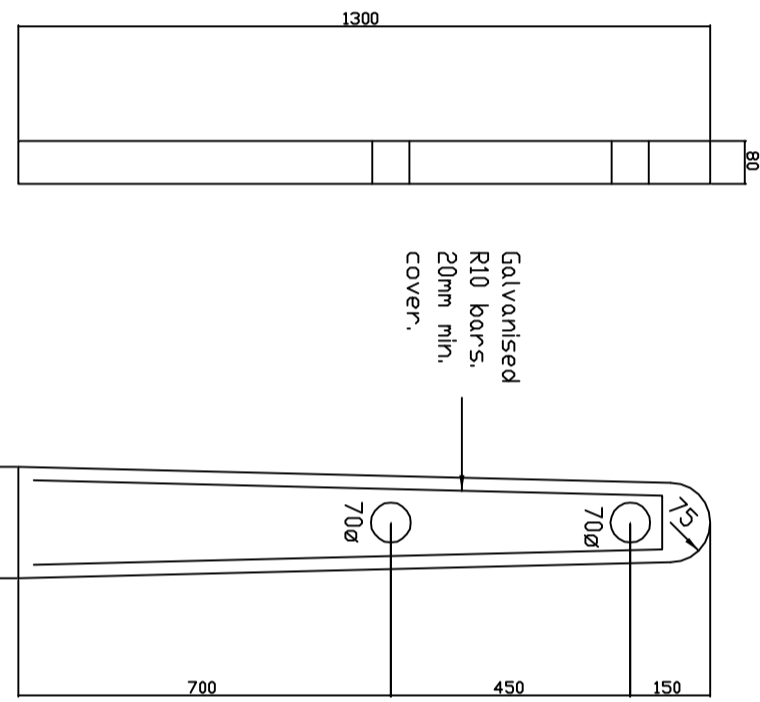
DETAIL OF CABLE DUCT MARKER AND HEADWALL
